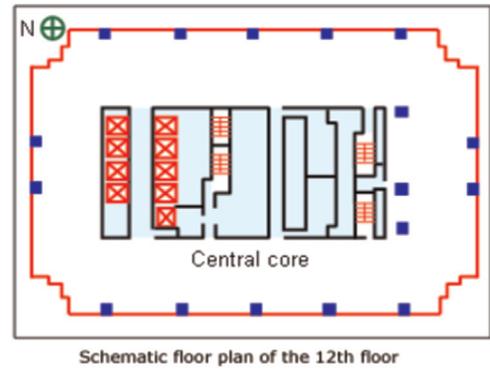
Plan of the 12th floor at the First Interstate Bank 1988 [14].
